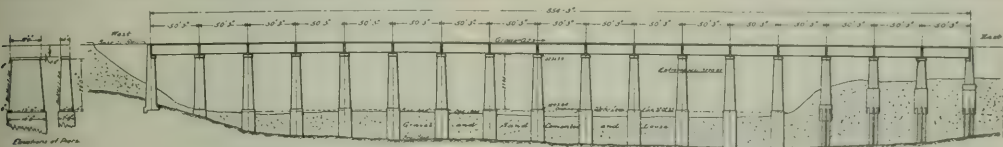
Kansas City, Mexico and Orient, Conchos River Bridge.
